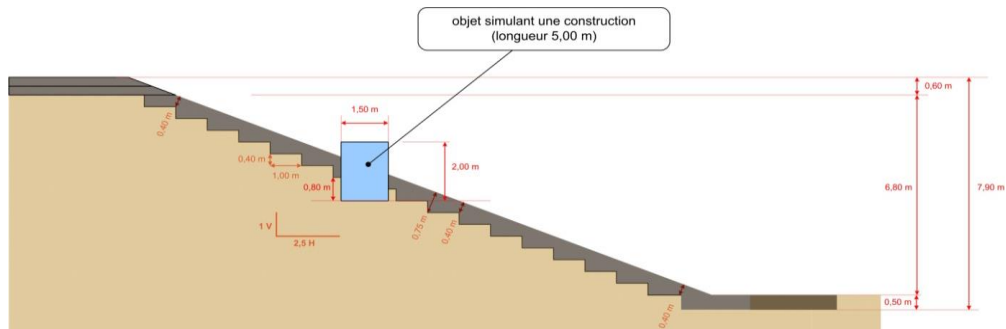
Construction methodology; Digging a hole, placing the object and densification around the object.
